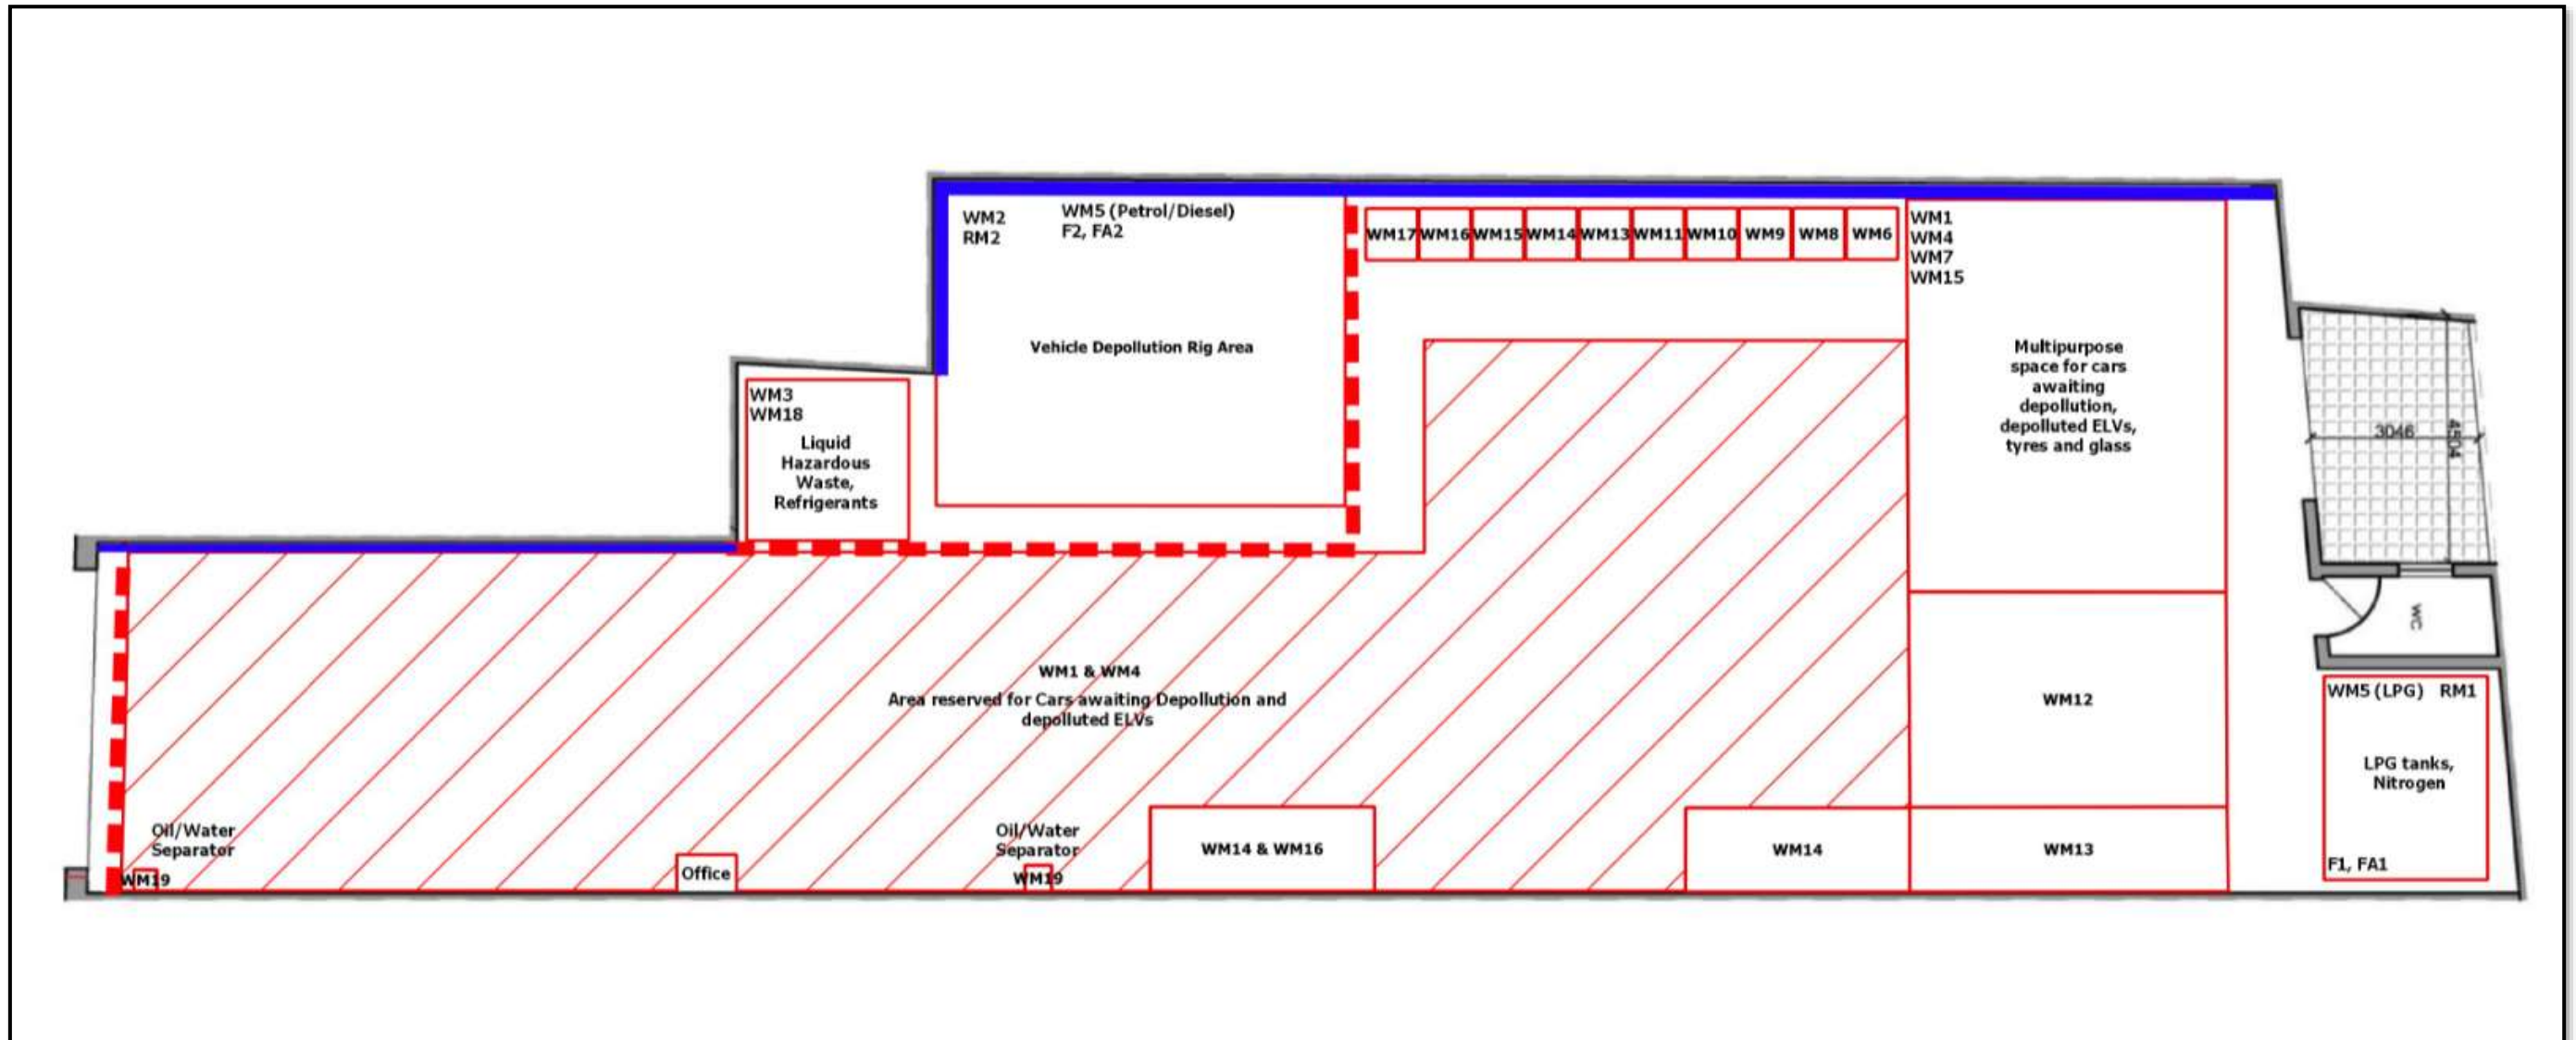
Site layout plan of permitted installation, showing extent of area for the carrying out of the activities specified in condition 1.1.1. The extent of the site is indicative and shall not be used for interpretation purposes.
